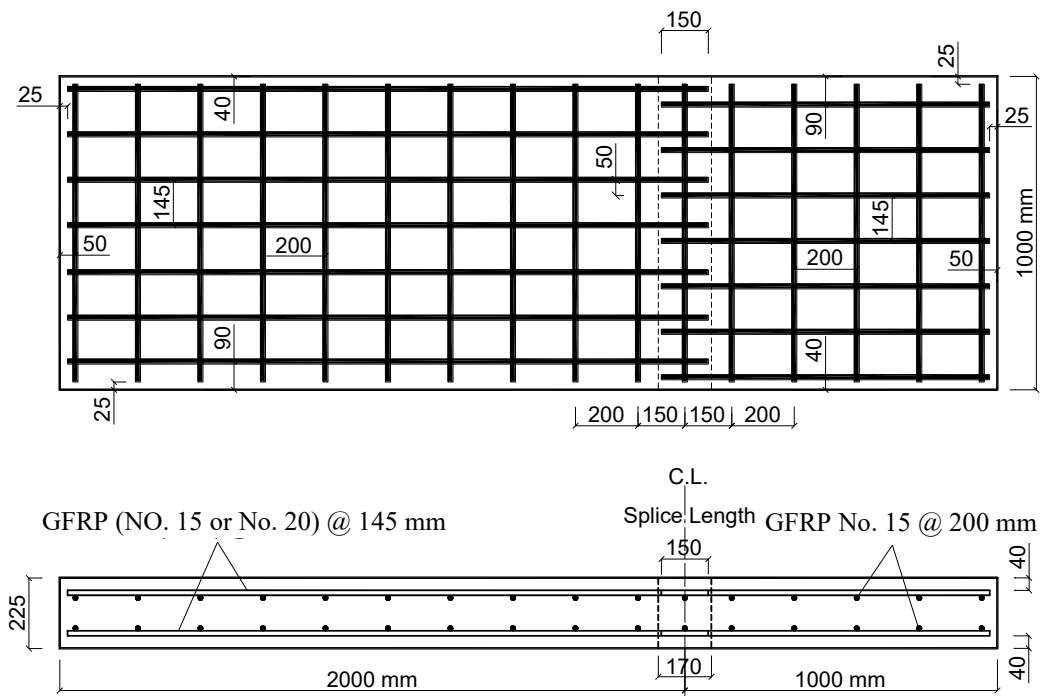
Concrete dimensions and reinforcement details of specimens G-150-15-A and G-150-20-A
